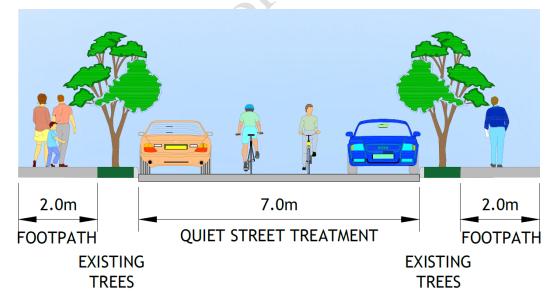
Cross-Section F-F (relevant to RG2 & RG4)
